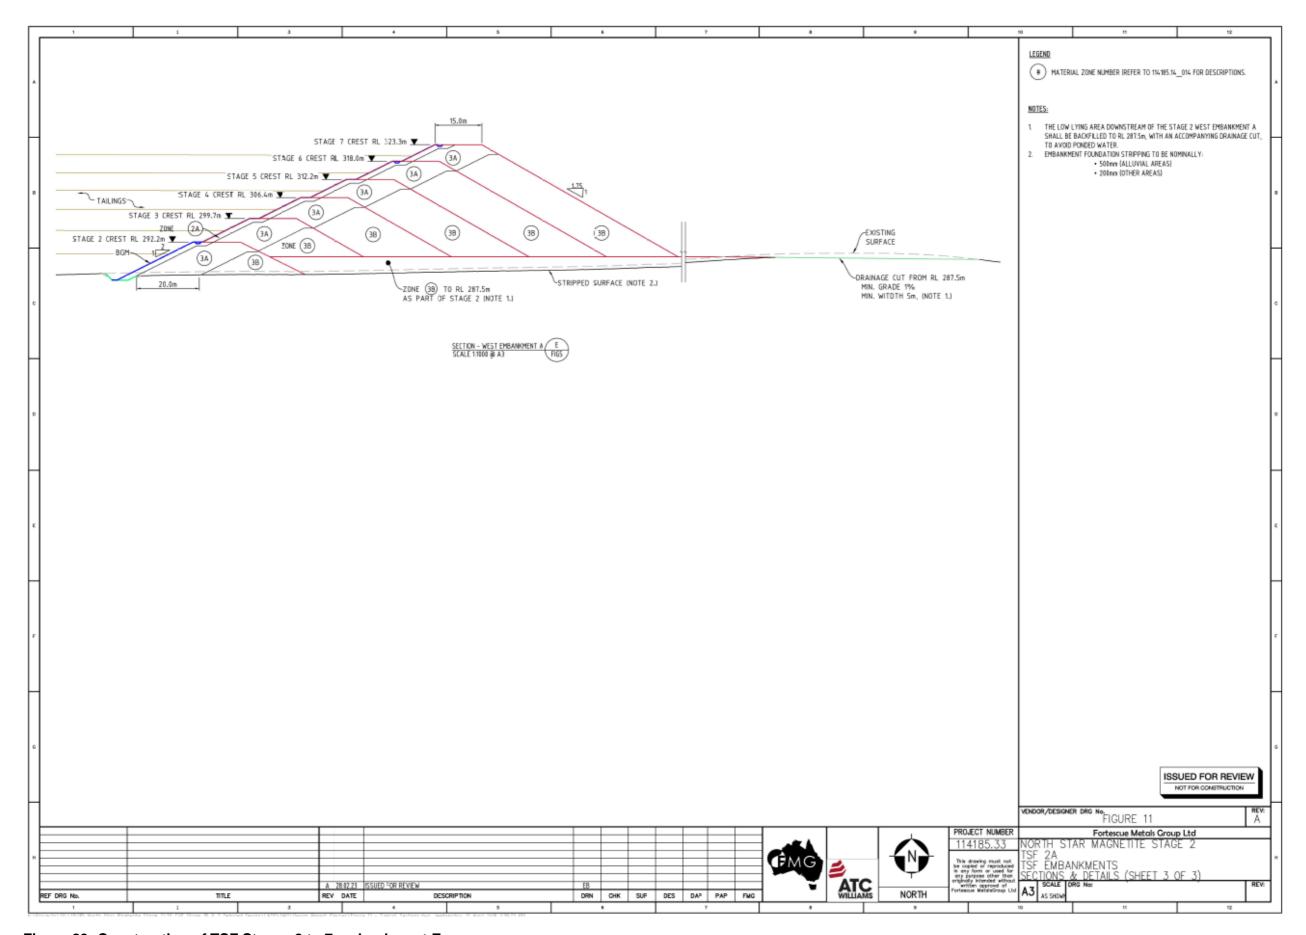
Construction of TSF Stages 2 to 7 embankment E
